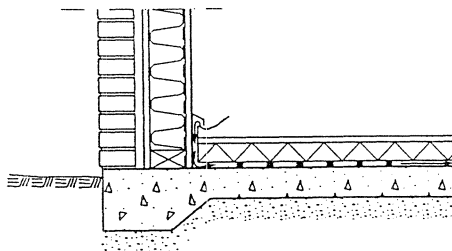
Building with a ventilated vapour barrier above the concrete slab.
